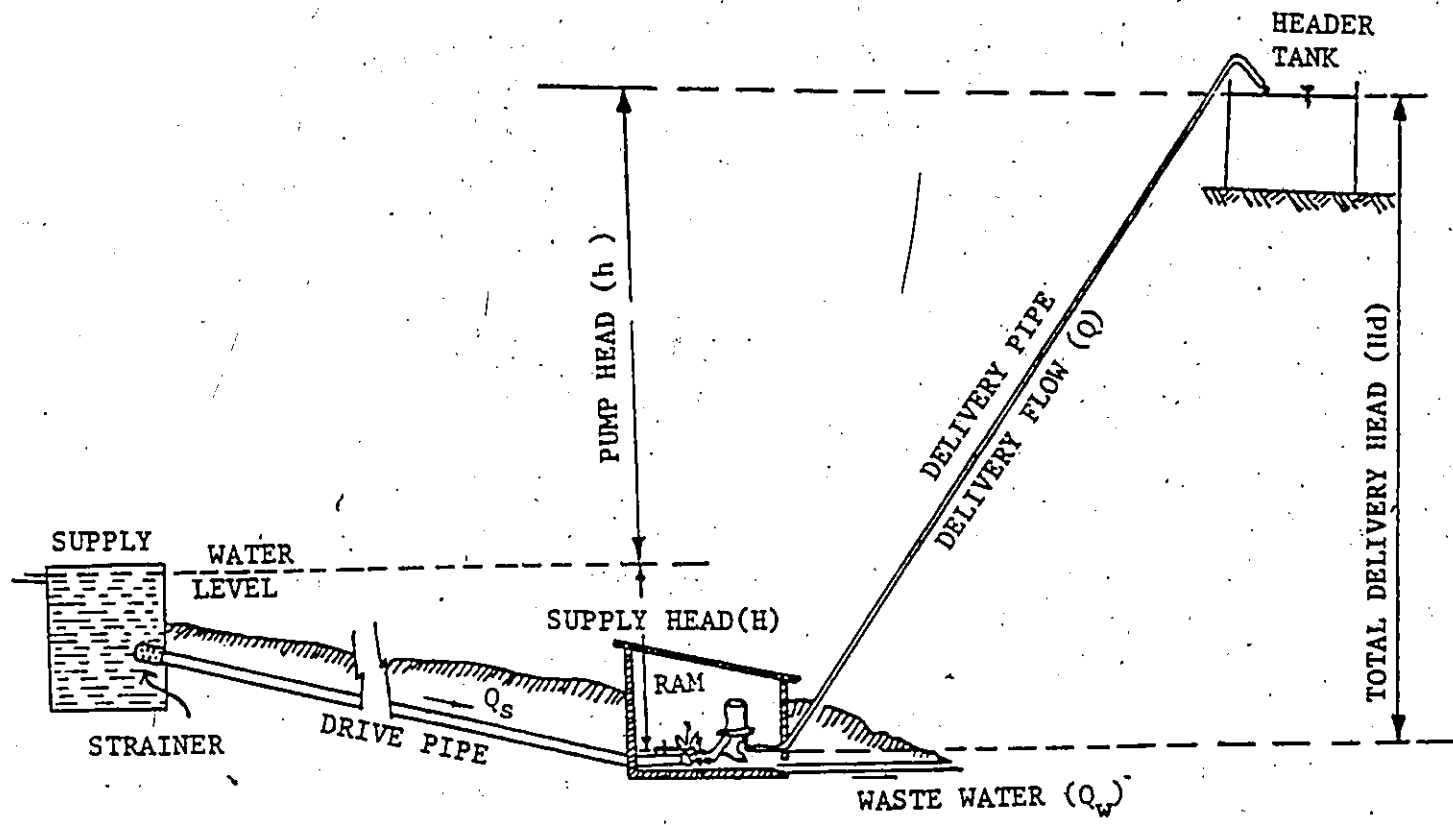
THE ARRANGEMENT OF A TYPICAL HYDRAM INSTALLATION
